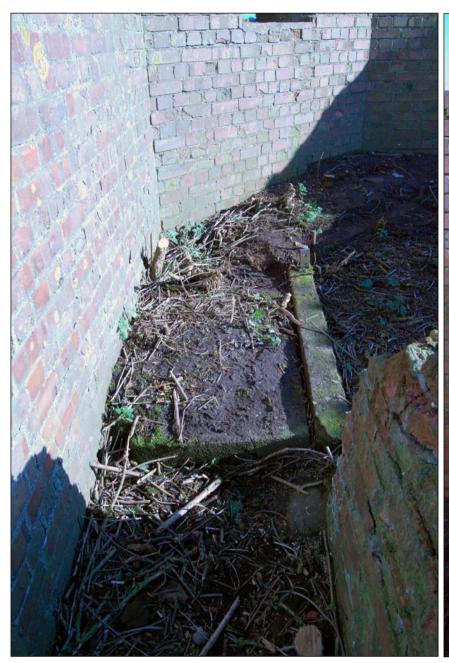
Left – HFDF curtain wall & foundations entrance, with concrete slab and octagonal internal foundation, facing east (photo colours edited to compensate for low light conditions)
